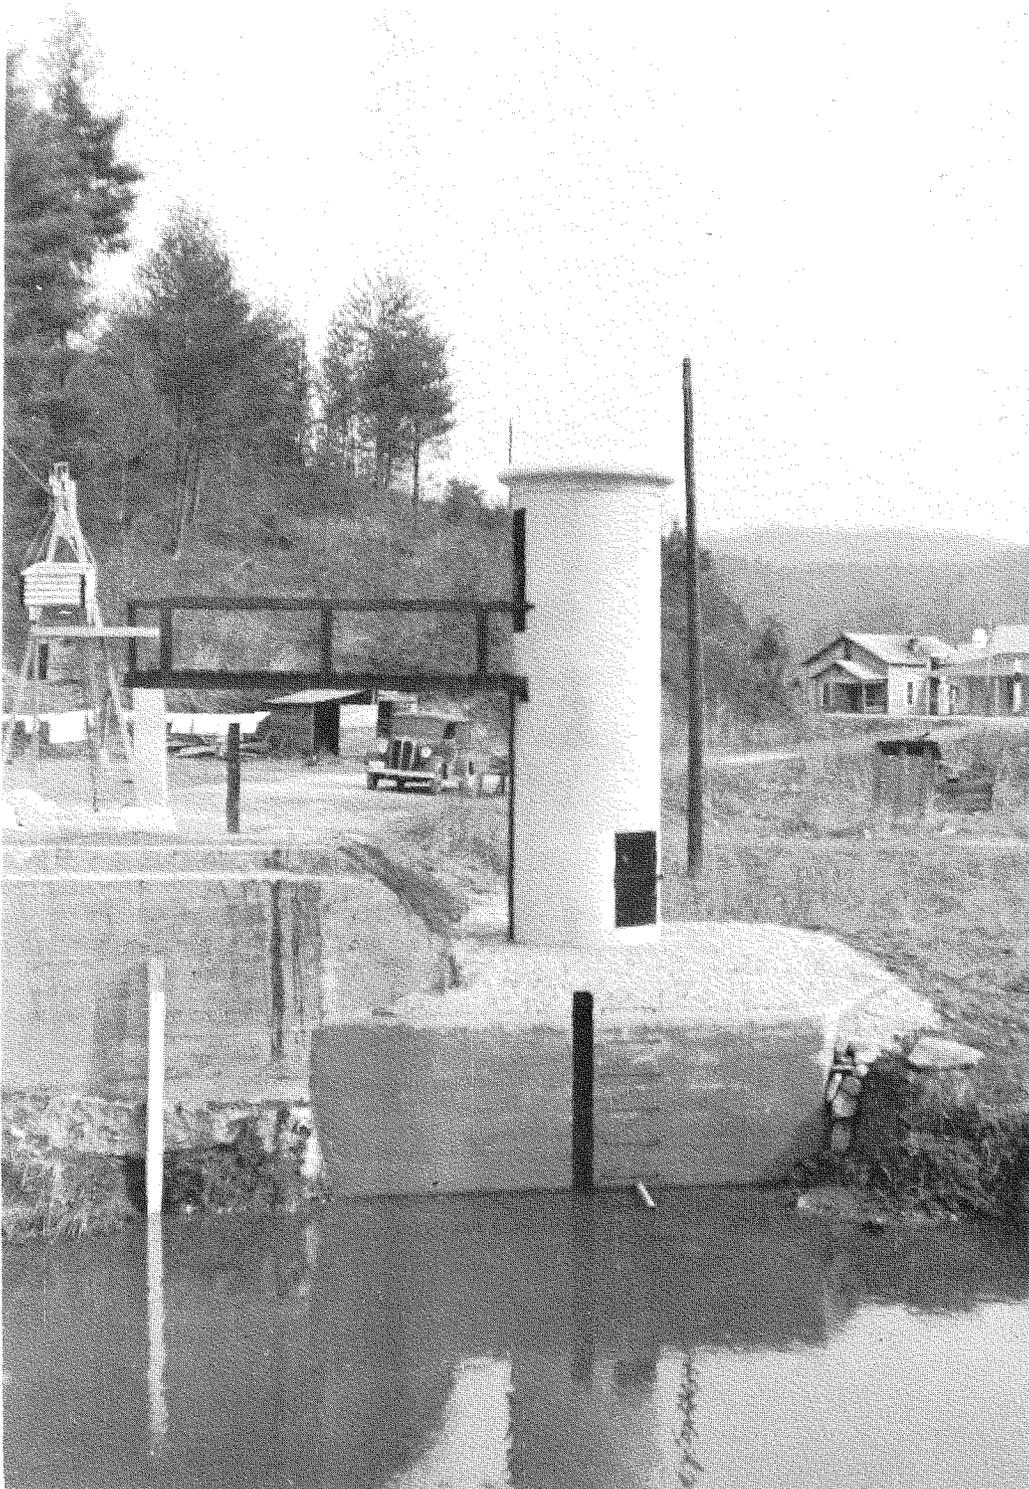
Concrete-pipe well and shelter. Note clean-out door, staff gage, and upper intake pipe.
